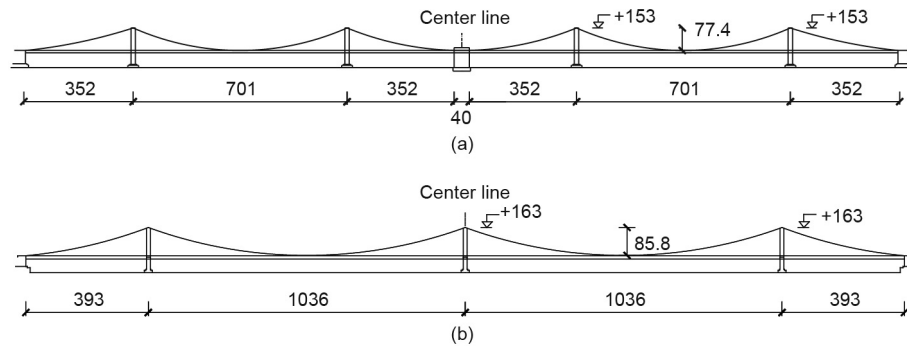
Single or double main-span suspension bridges. (a) Two single main-span suspension bridges; (b) one double main-span suspension bridge. Unit: m.
